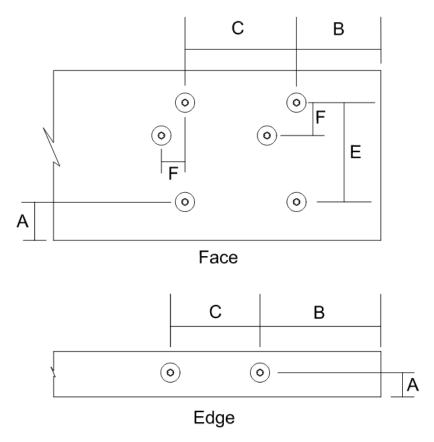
EXAMPLE OF FASTENER SPACING IN WOOD
